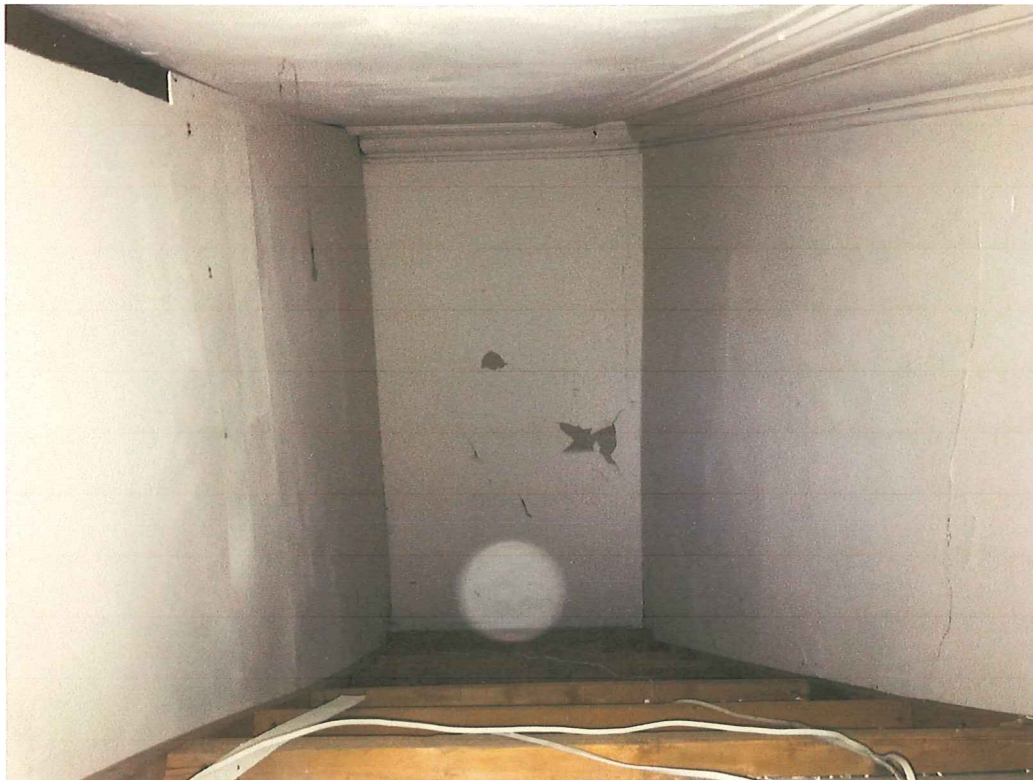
Void over stairwell Ceiling, showing original ceiling and modern partition to the left.
